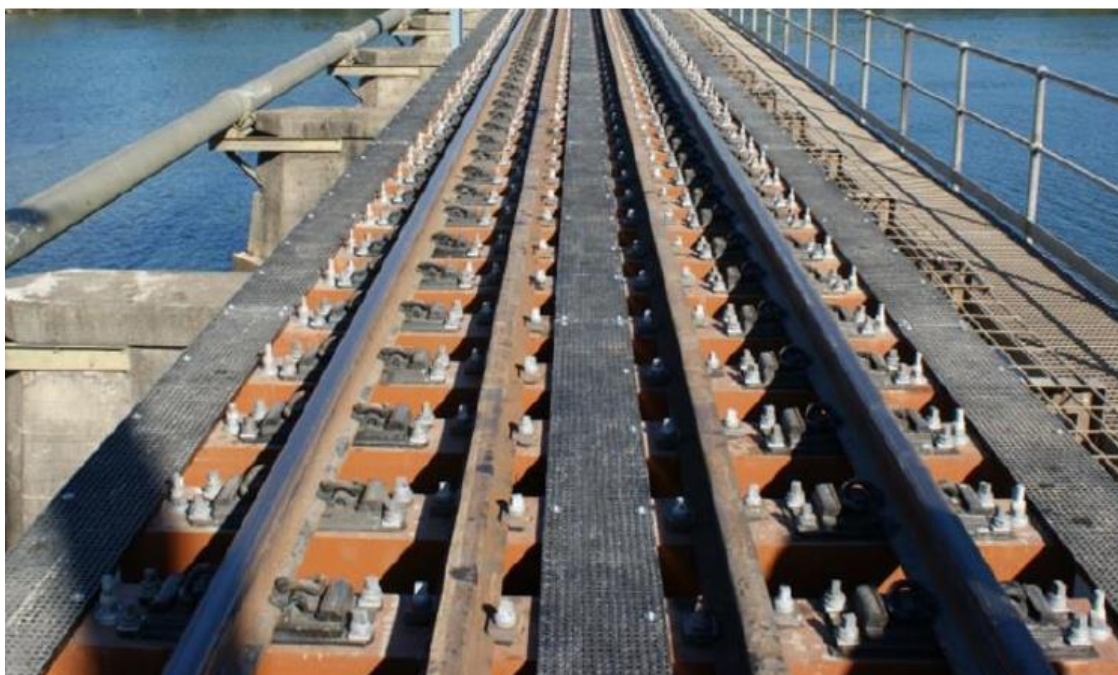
FFU Transoms installed on Minnamurra Underbridge, Sydney
